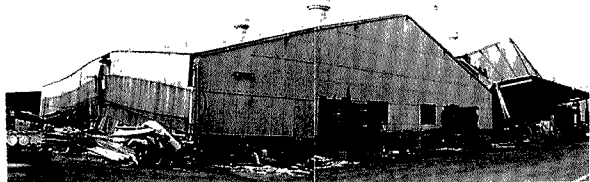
Failure of a two story steel-frame warehouse: Sendai Un-yu Soko.
